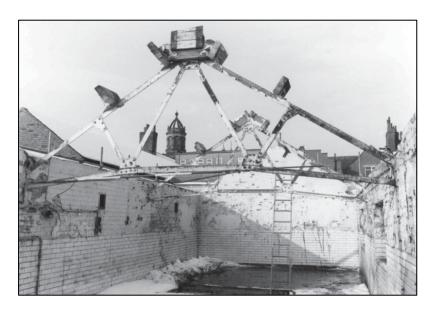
Building A, 1F showing typical roof truss, looking N (photo 8/7).
